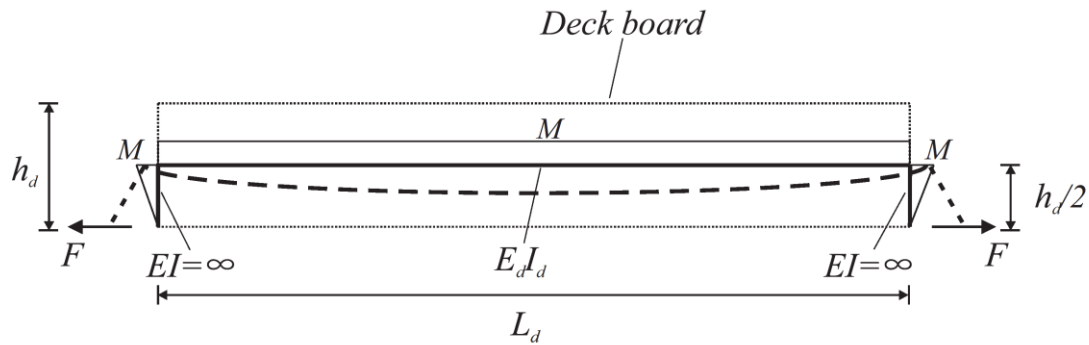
B.1 Cross-sectional elevation of a deck board with axial deformation due to eccentric lateral loading F acting at the deck underside
